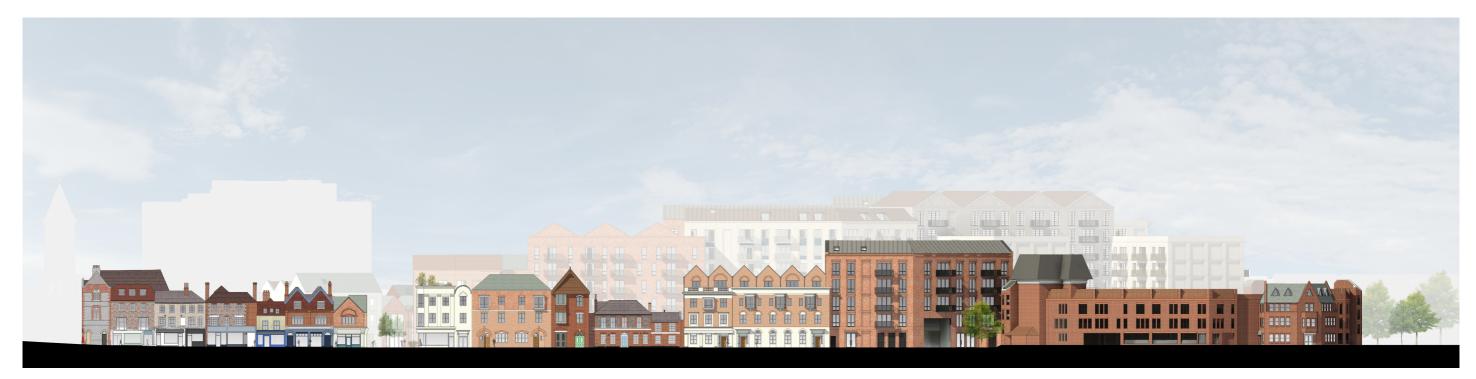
Proposed Bartholomew Street Elevation. Source: Collado Collins Architects
